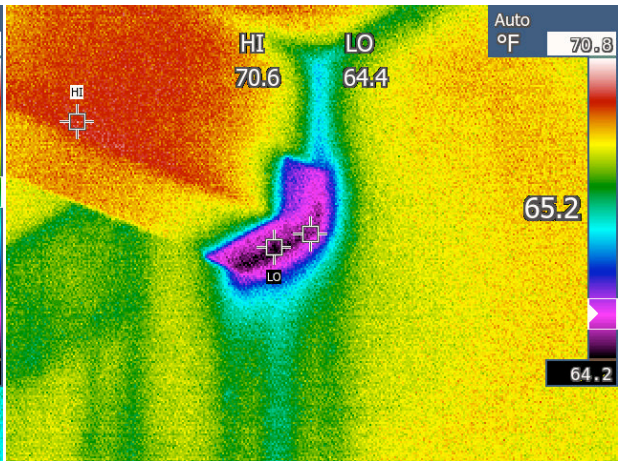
P1 thermal bridge at structural beam, metal bracket-cold spot
